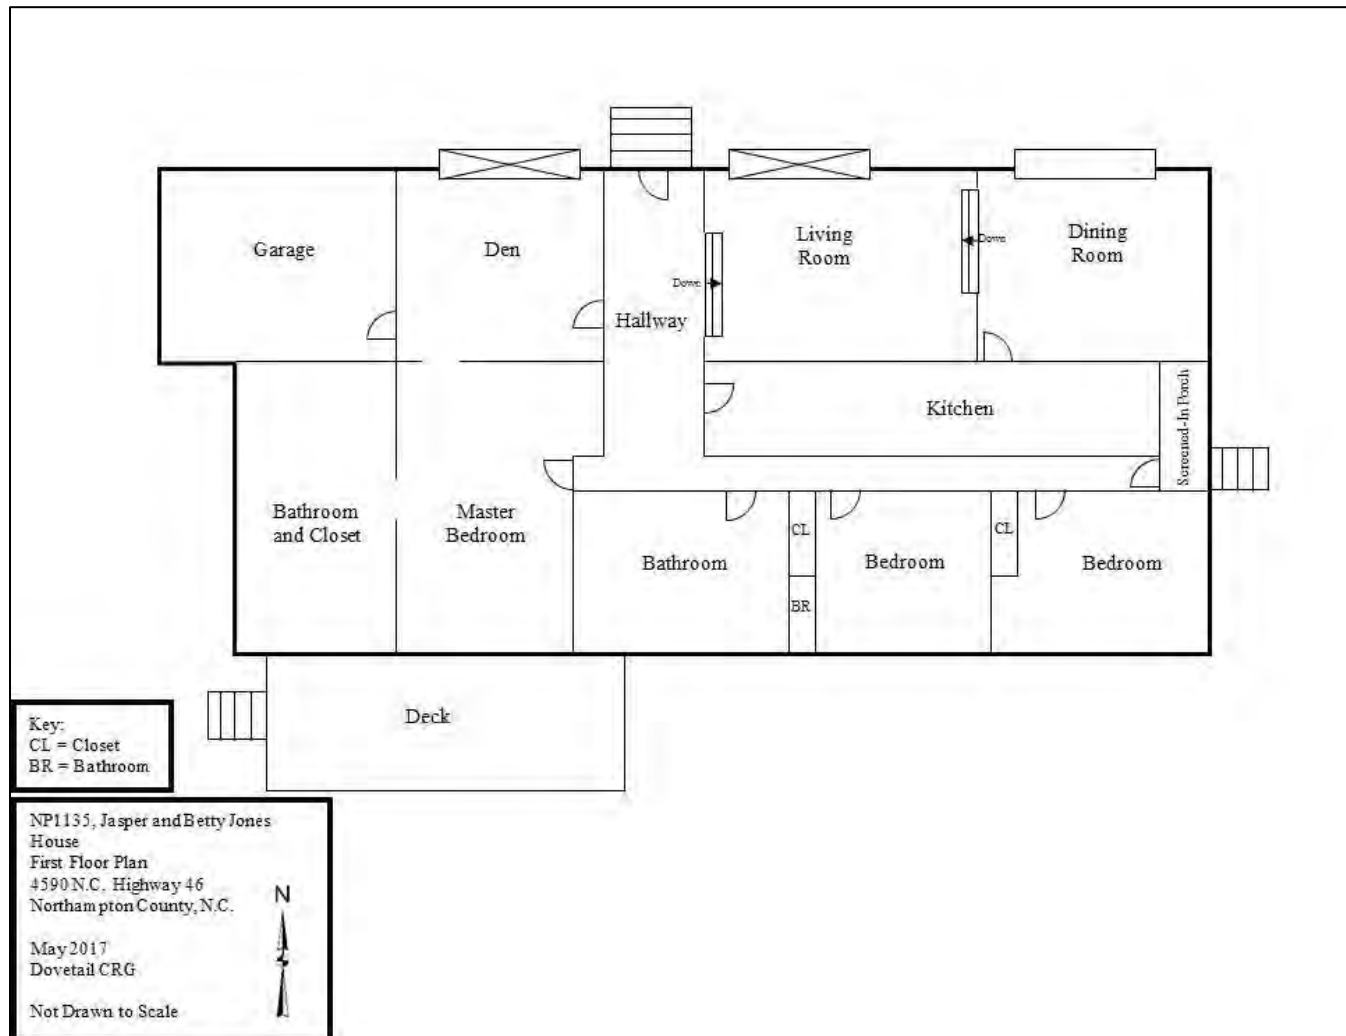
First Floor Plan of the Jasper and Betty Jones House (NP1135).
